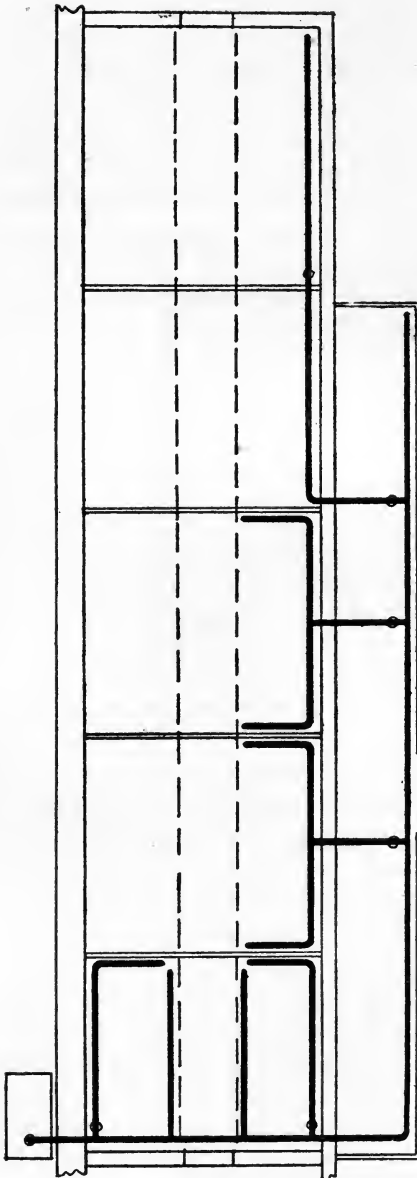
Plan of piping system in a range of glass-houses and pits.
